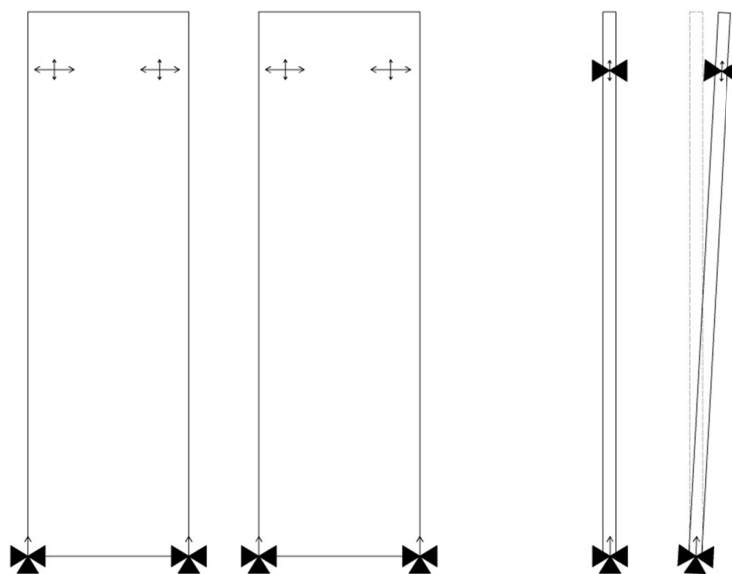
Isostatic cantilever arrangement for vertical panels
